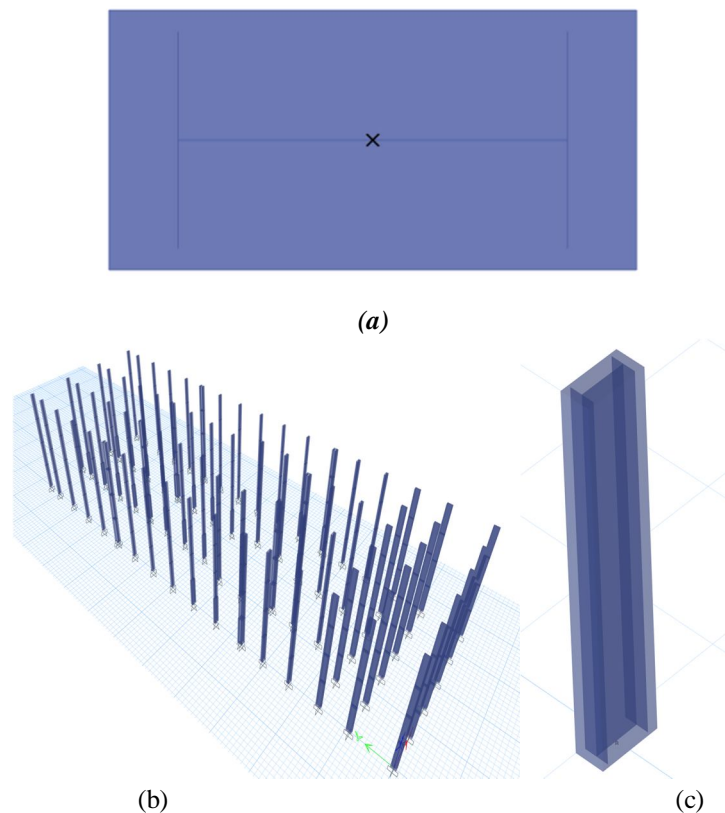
Concrete Encased Column incorporated in the Considered Models (a) Concrete Encased Steel Columns Provided in Building (b) 3-D view of CES Columns (c) Plan View of CES Column
